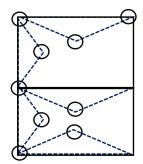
Formation of Unacceptable Plastic Hinges in Single Structural Member for Buried Rectangular Box Section
